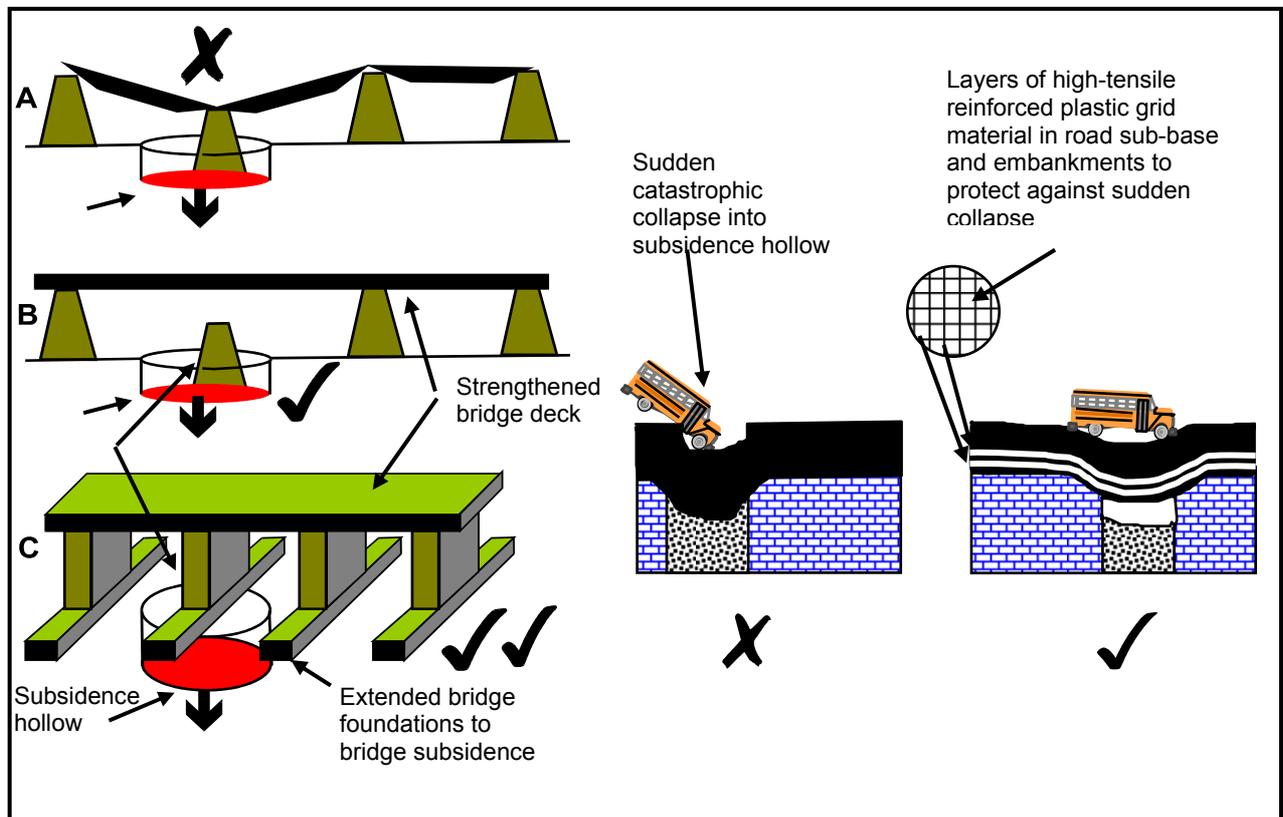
(Left) Sacrificial supports and extended foundations in bridge construction to protect against sudden subsidence failure. (Right) The use of geogrid material in road construction to protect against sudden collapse.
